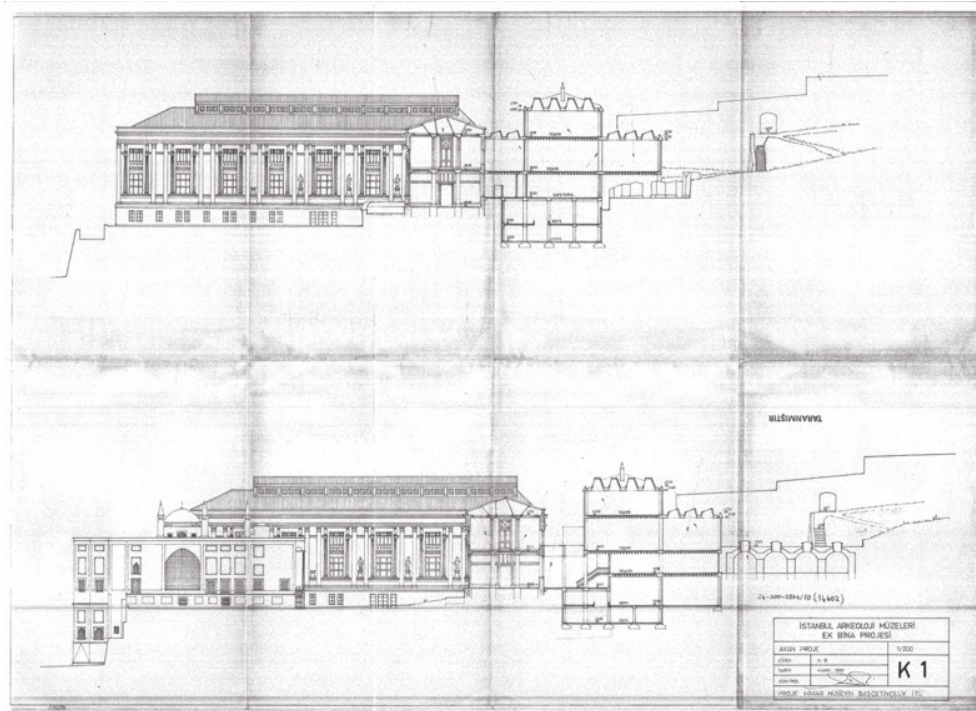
The sections of the proposed project for Additional Building of IAM dated to 1971 (source: ICCCH-Archive)
